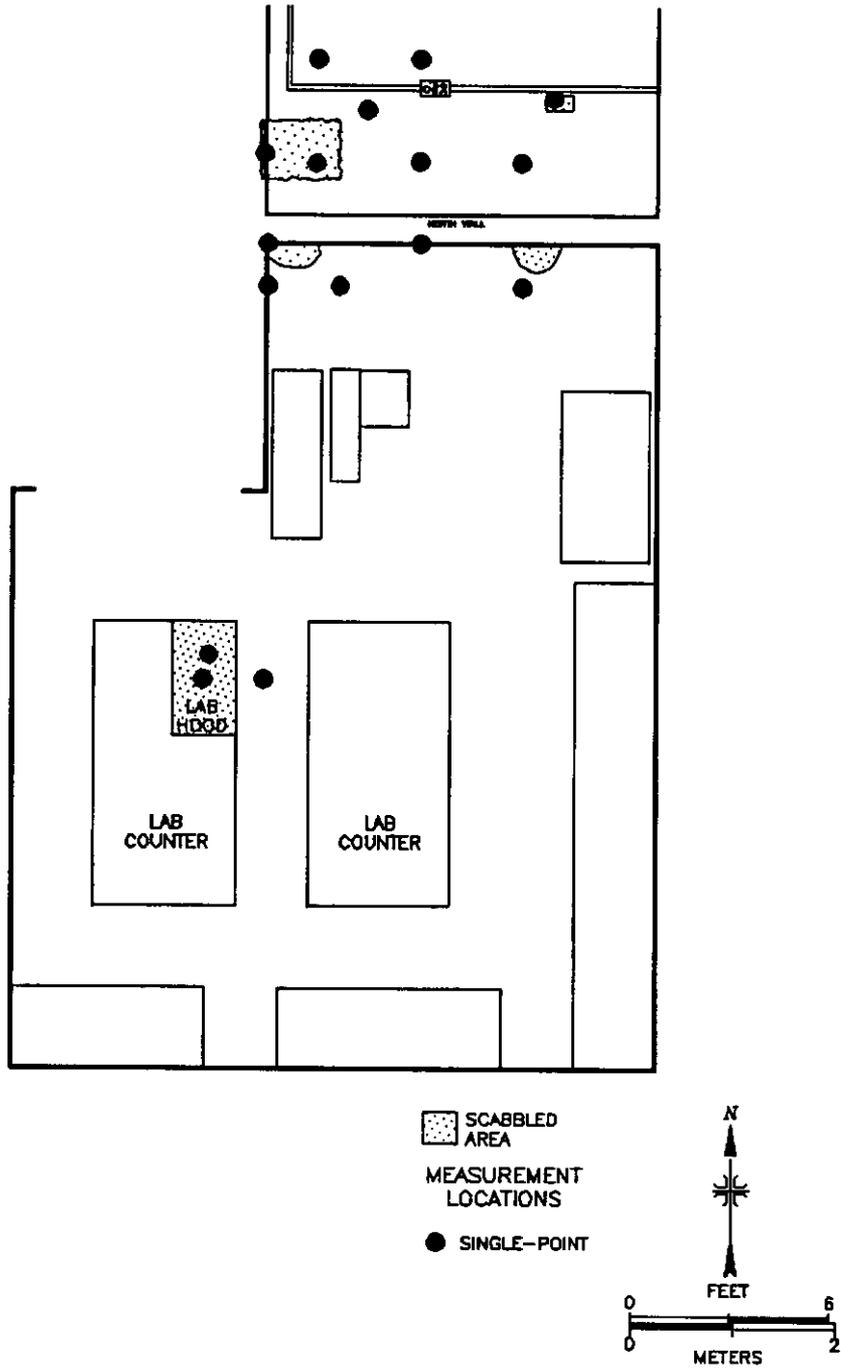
Building 31, Room 2, Indicating Measurement Locations on the Floor, North Wall, and Counter Space
